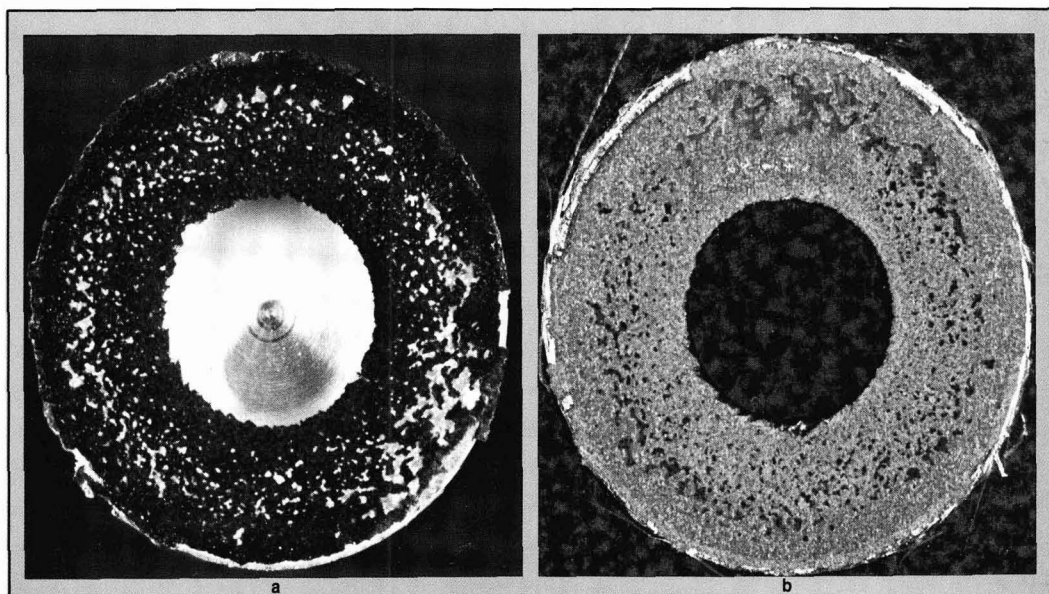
Typical failure surfaces for the E1/T system: (a) cylinder; (b) steel sheet
